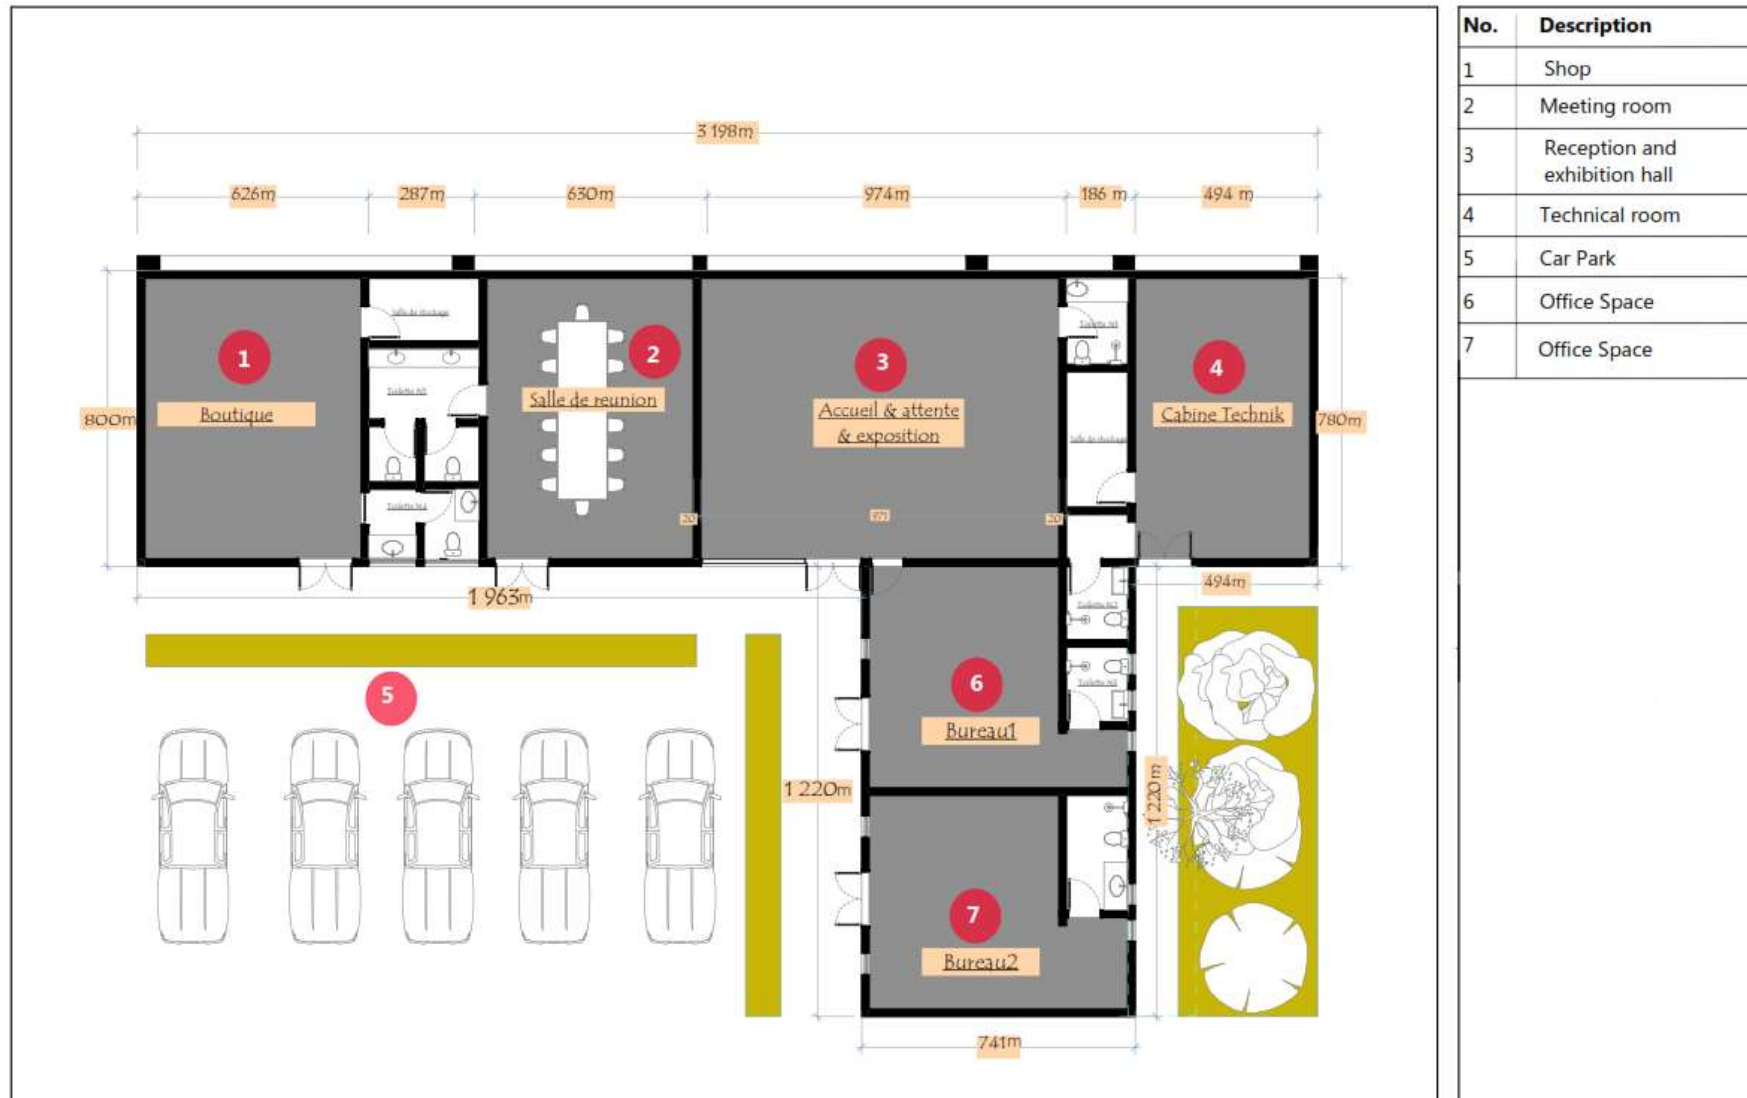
Layout Plan of the cashew nut processing plant showing the different sections of the facility
